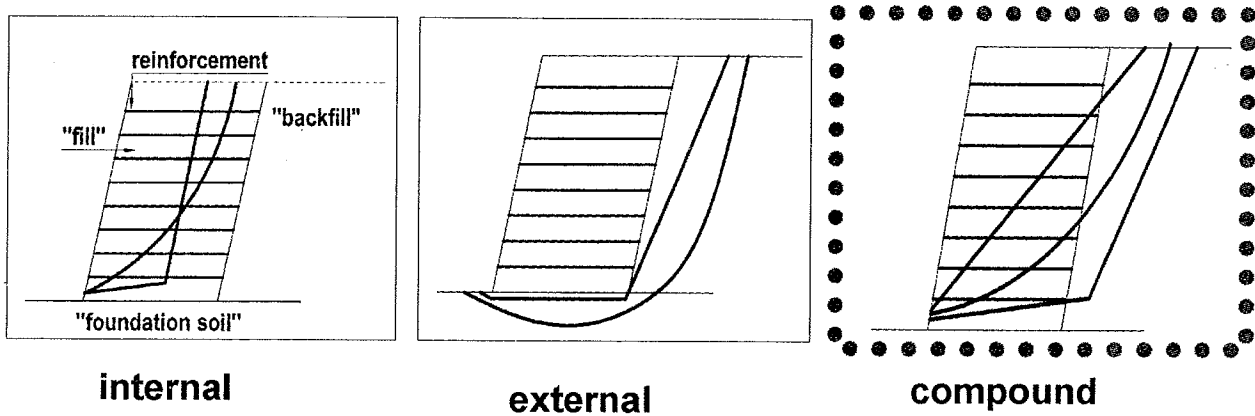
Typical possible modes of failure for geosynthetic-reinforced slopes
